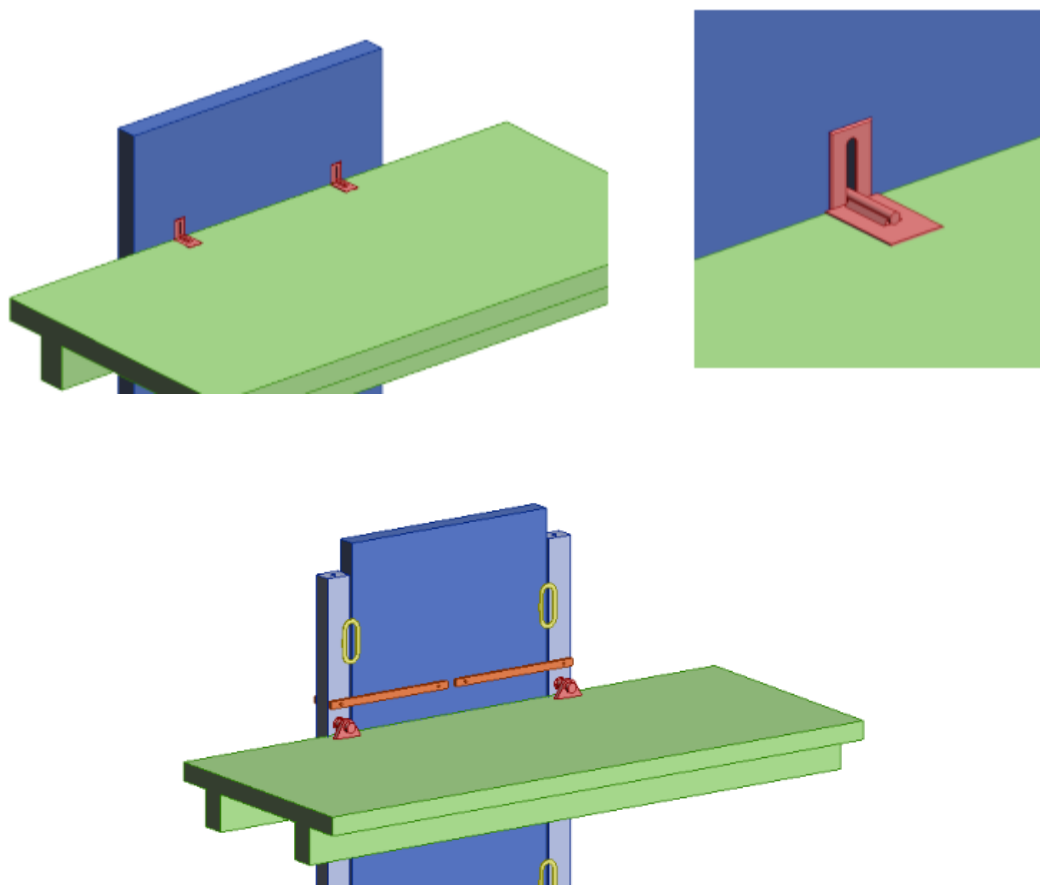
Proposed details for diaphragm connection to rocking walls (Henry et al., 2011)
